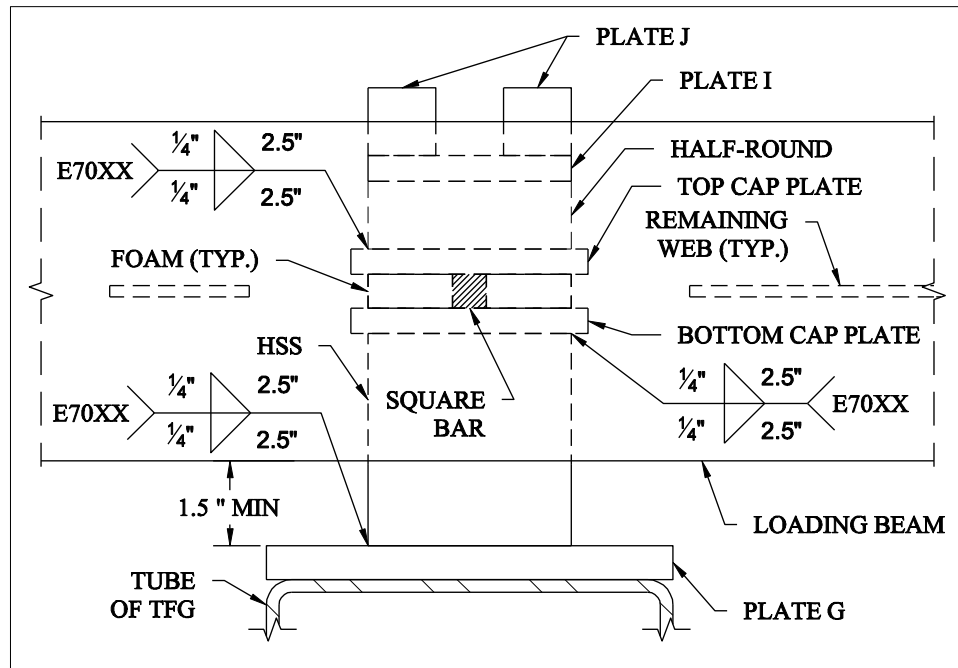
Detail C of Figure 5.4 and Detail D of Figure 5.5 - parallel plane cross section view of load bearing assembly at Section C and at Section D
